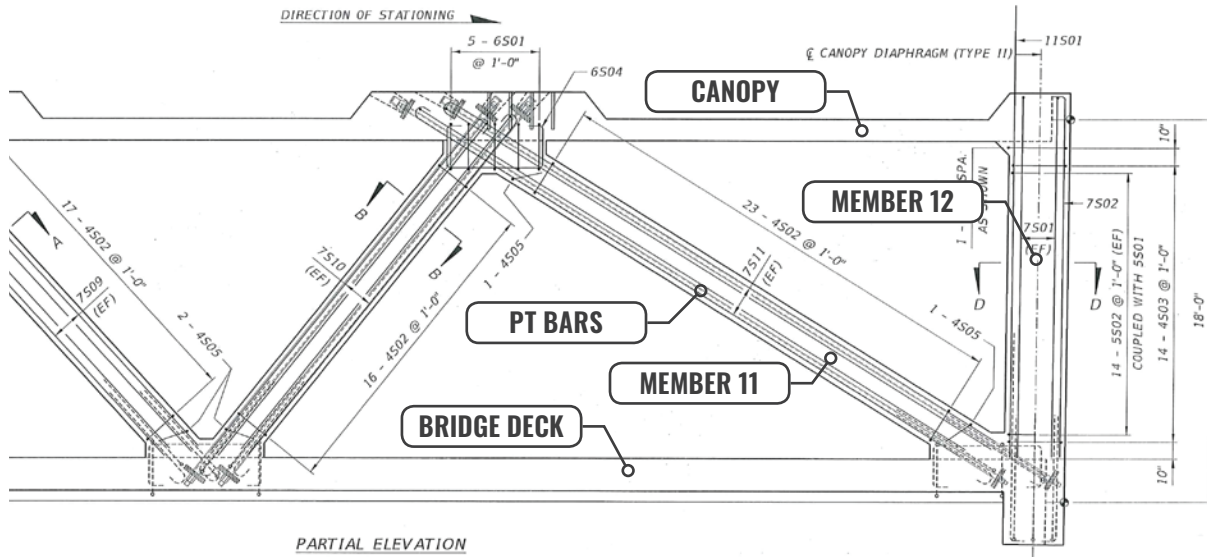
North end diaphragm reinforcing details from RFC plan Sheet B-47.
